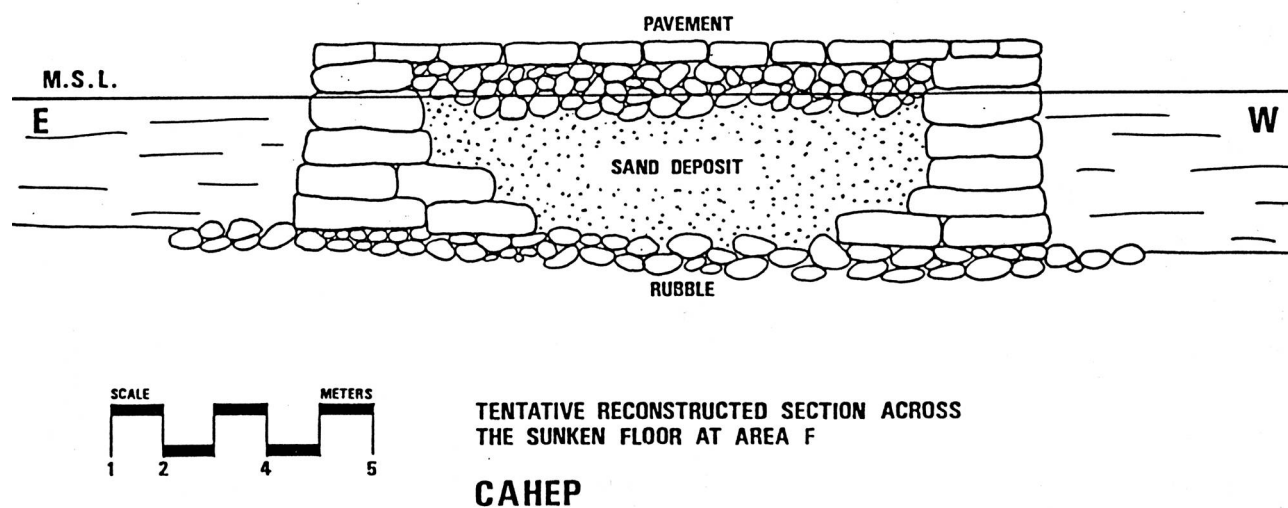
Tentative reconstructed section across the sunken floor at Area F (A. Raban, Caesarea Project)
